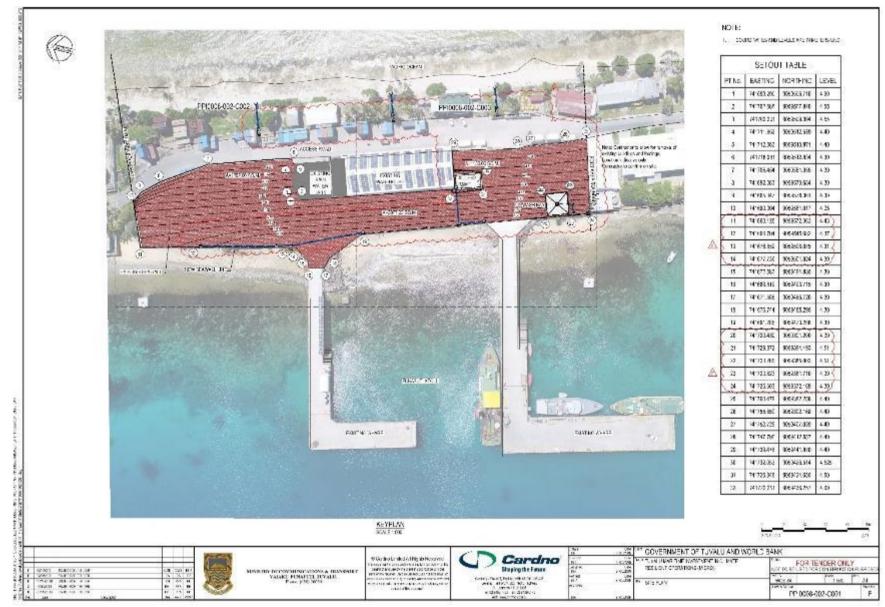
Site plan for the Funafuti port work improvement and area of impact (dashed line).
